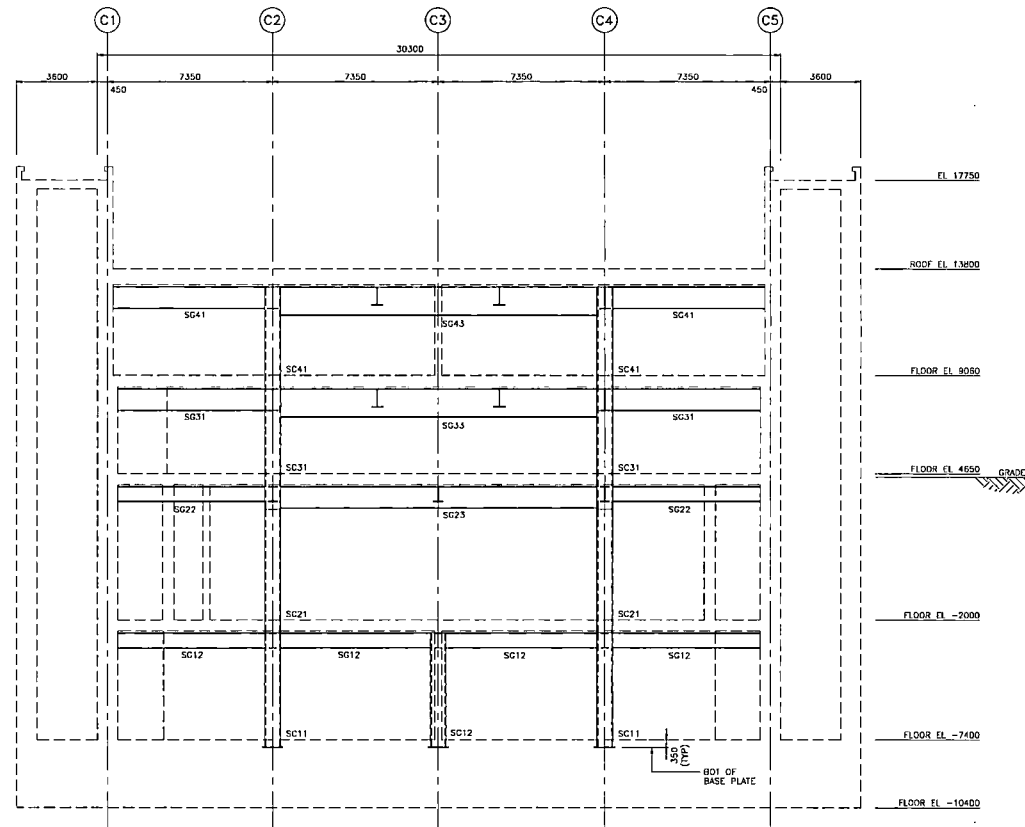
Structural Steel Member, Elevation on Col-Row CB
